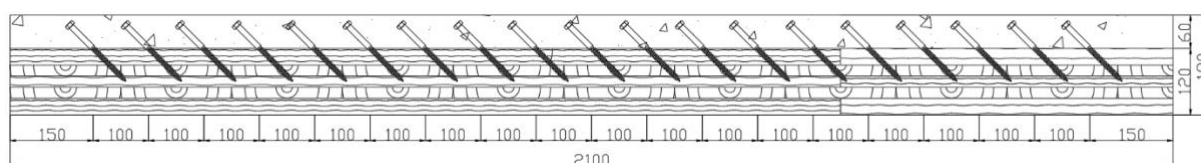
Longitudinal section of the CLT-concrete composite slab with KOP screws [mm]
